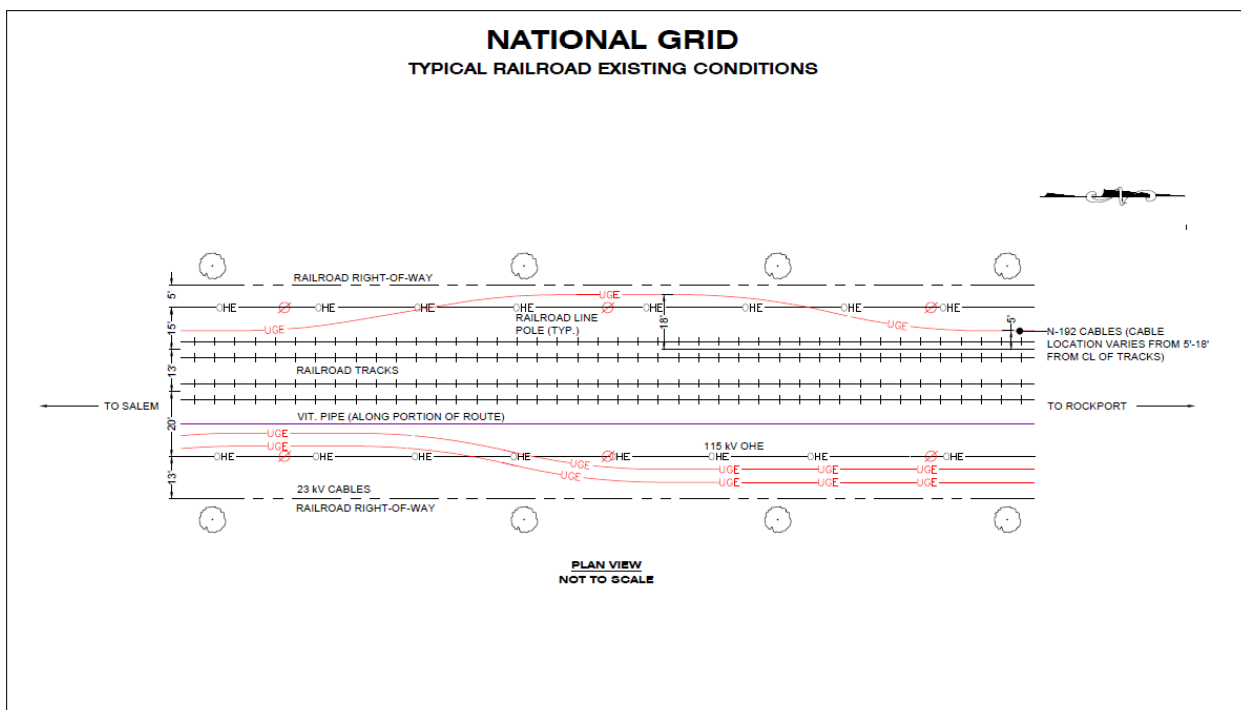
Plan View of Typical Railroad ROW with Existing Conditions
